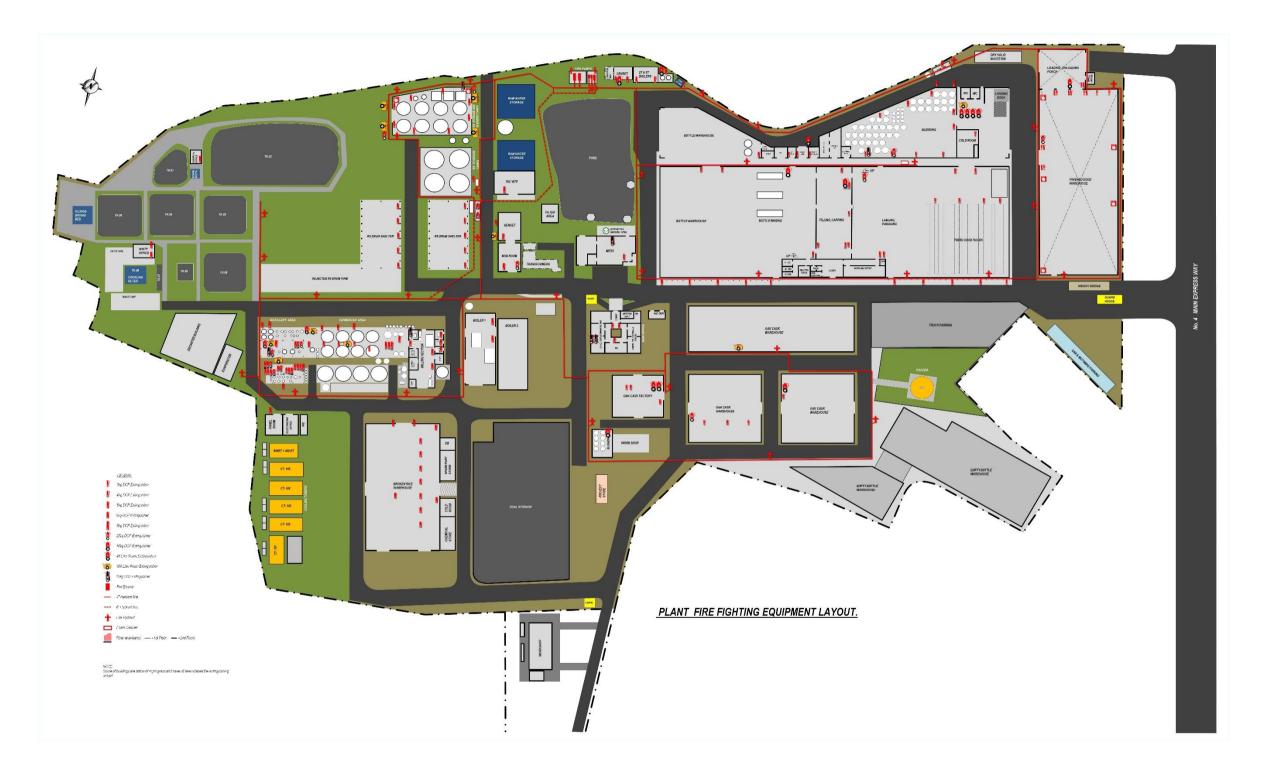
Plant Firefighting Equipment Layout of GRGICL
